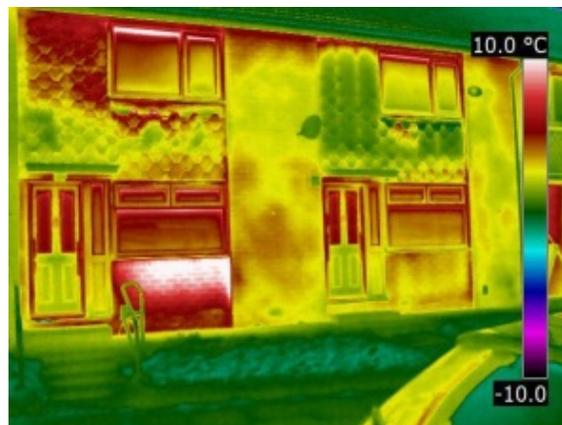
Brick and tile cladding finish cavity wall dwelling (assumed uninsulated), showing fluctuations across façade, particularly below window cill and at high level beneath cladding.
